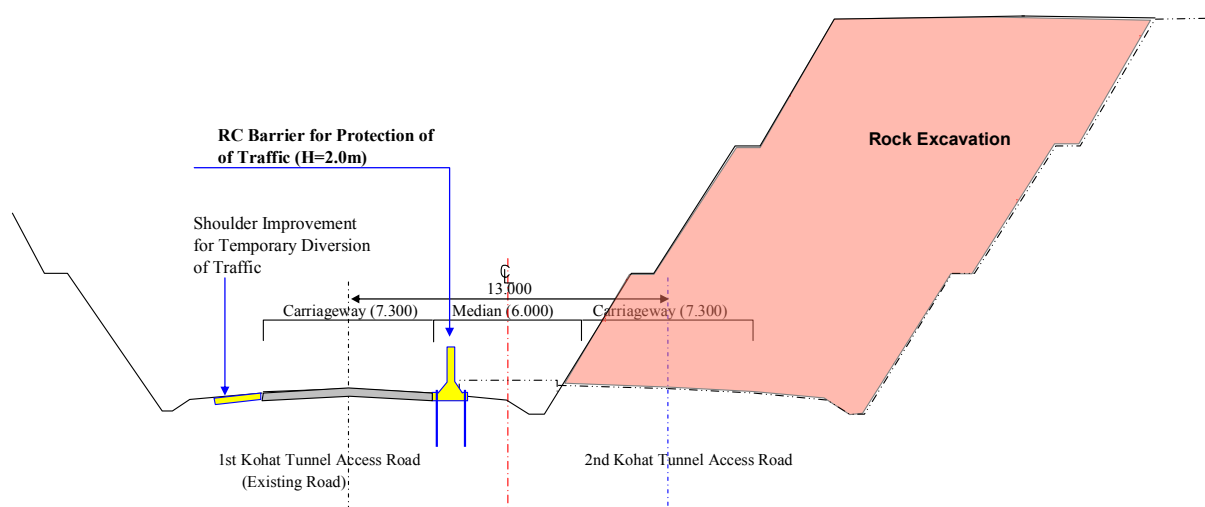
Temporary RC Barrier for Protection of Public Traffic
